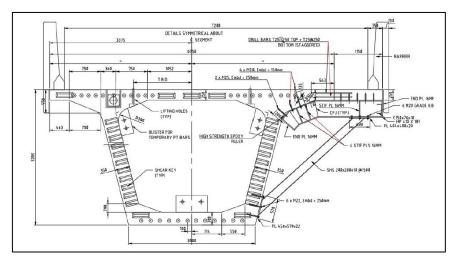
Bridge Deck Cross-section (dimensions in mm)
